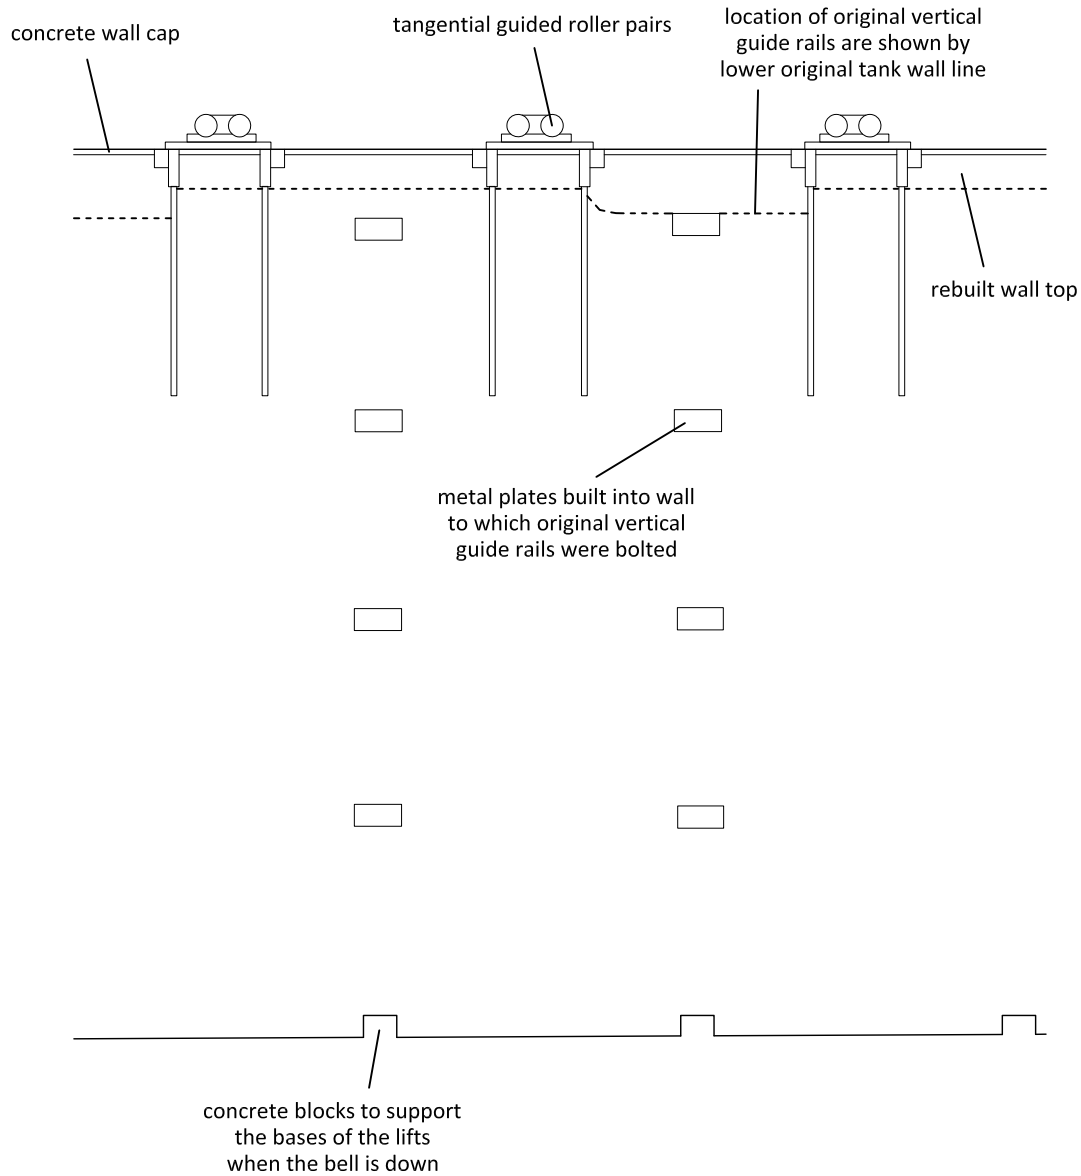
Gasholder No 4, north-facing tank wall elevation sample
